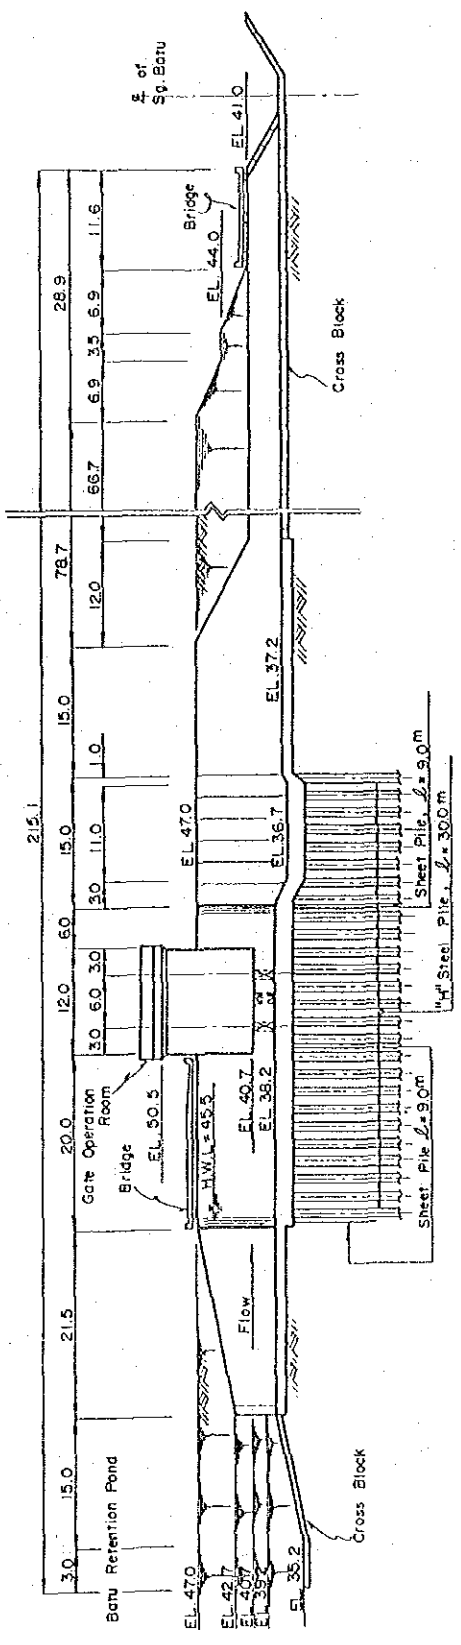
LONGITUDINAL AND CROSS SECTIONS OF INLET SLUICE GATE
